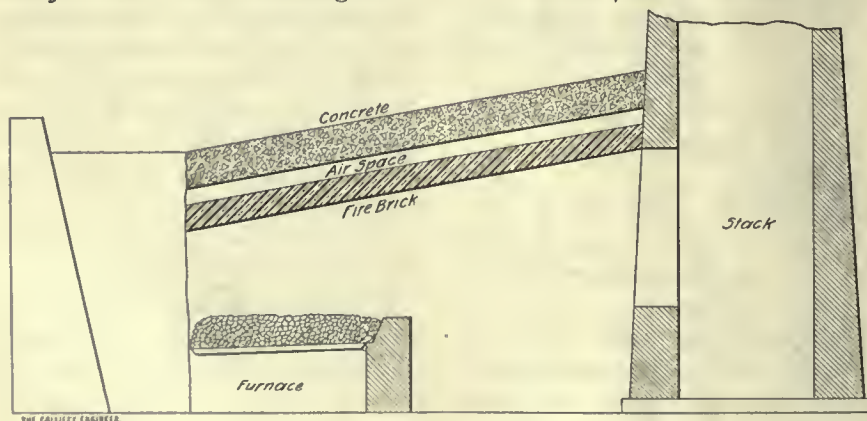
ELEVATION OF FURNACE, AND CROSS-SECTION AT FIRE BOX
